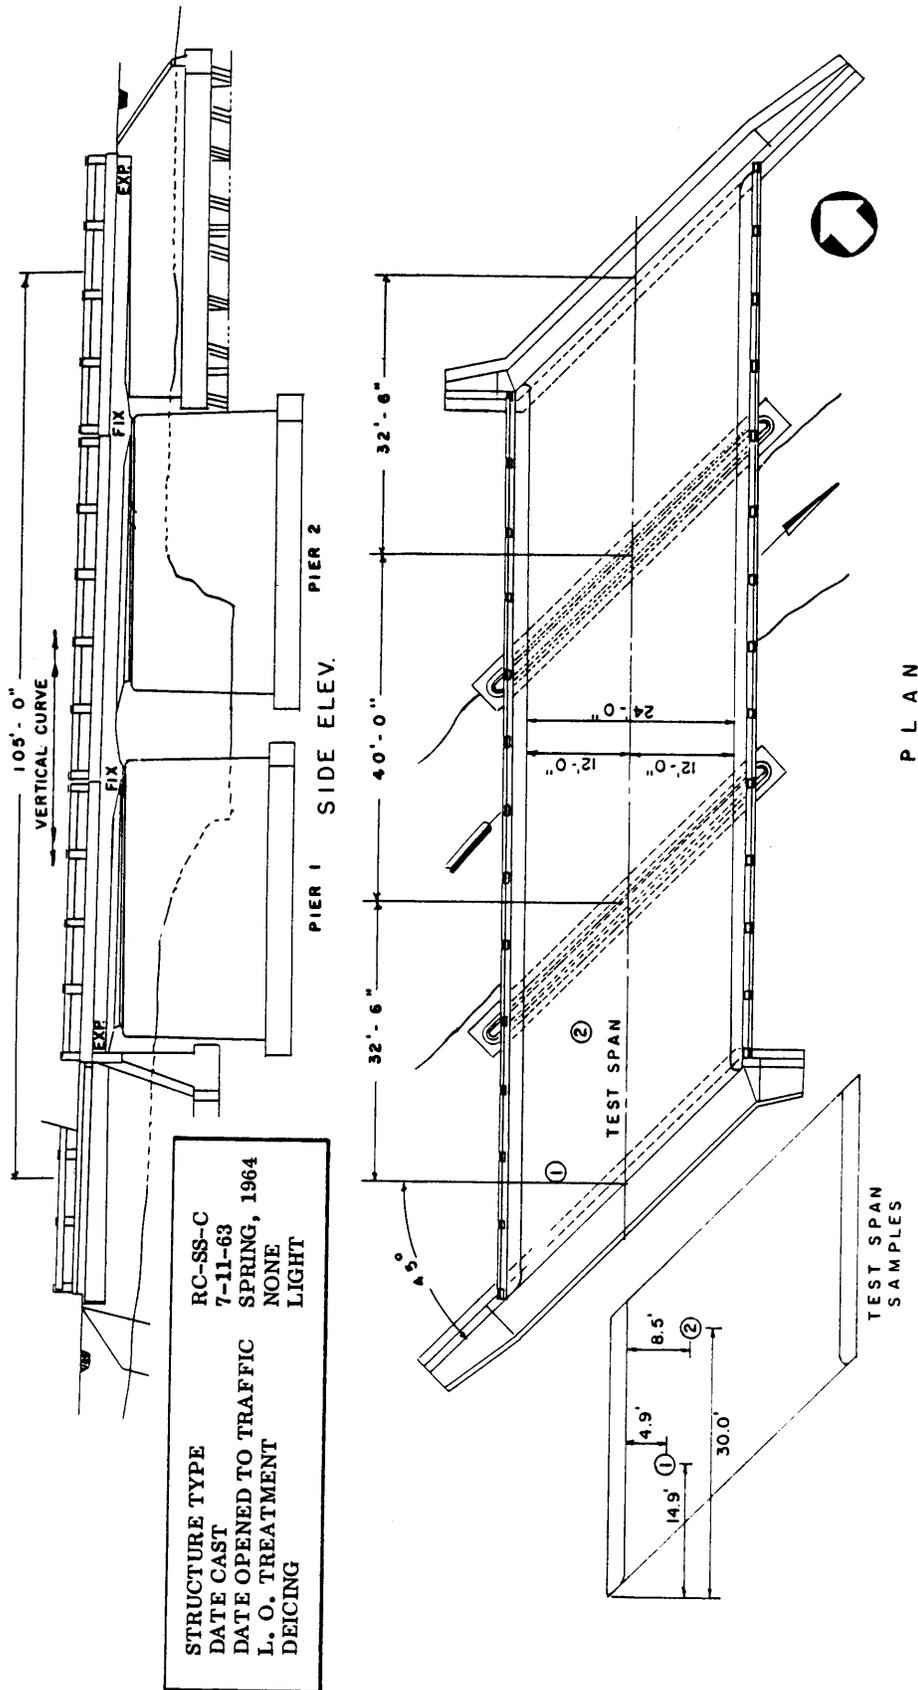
Plan for bridge #10; also shown are the locations of test samples.
